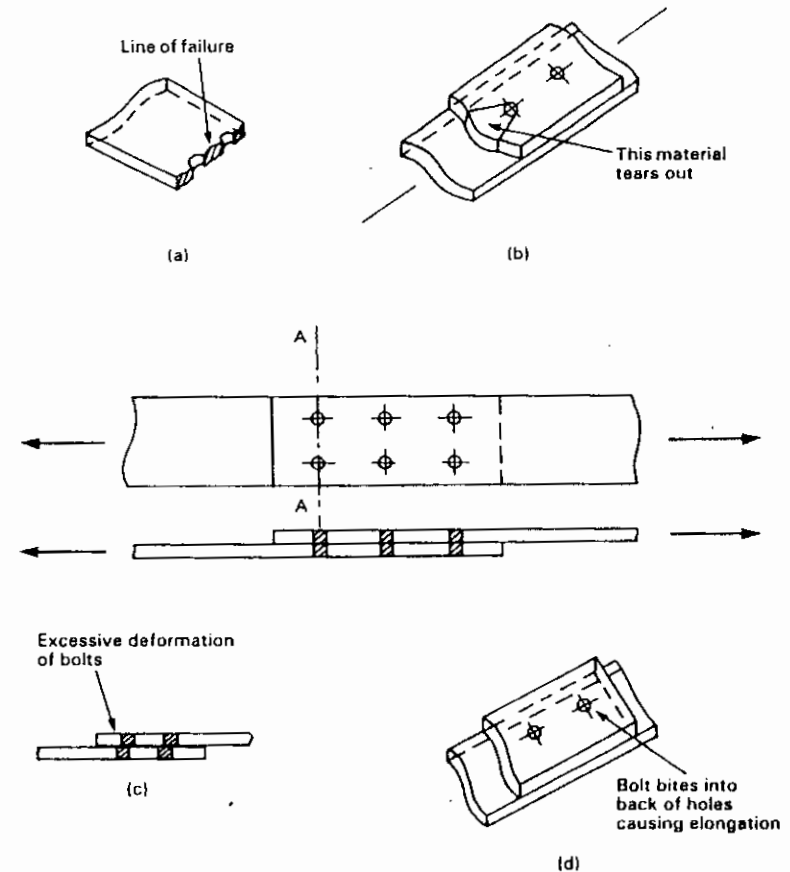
Basic failure modes for bolted connections. (a) Tension at net section AA; (b) end failure of plate; (c) shear of bolts; (d) bearing.
